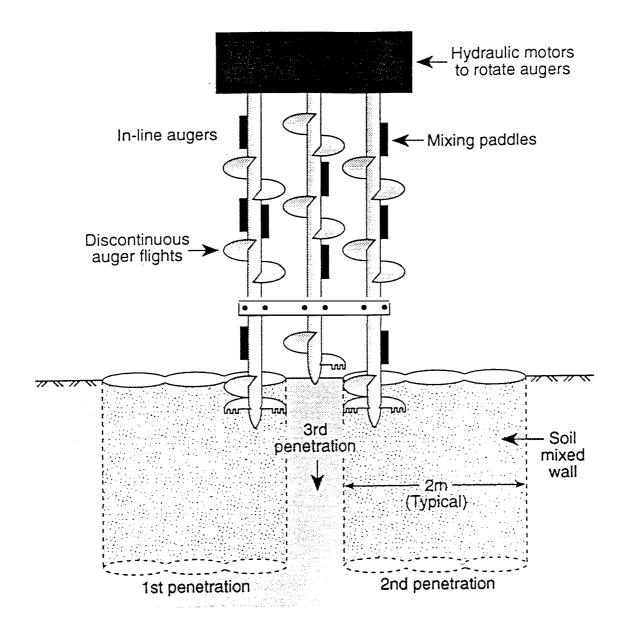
Deep Soil Mixing (Rumer and Ryan, 1995)
